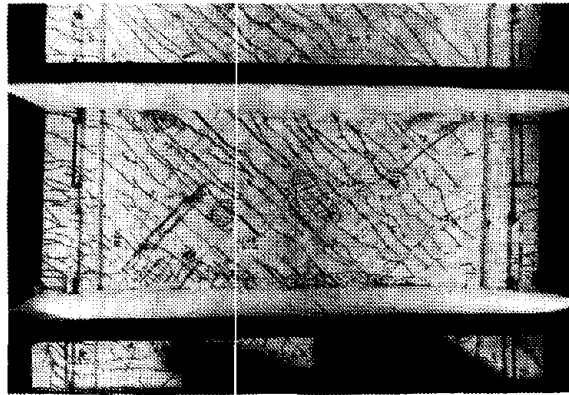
LP 611 Initiation of concrete crushing at second story
